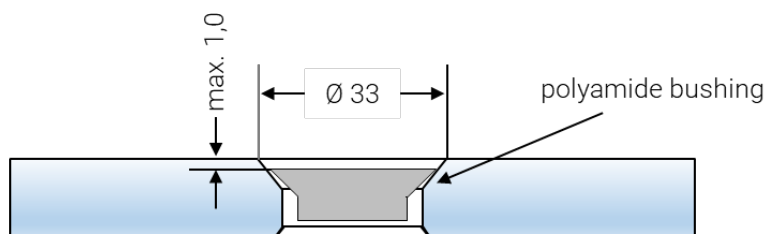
schematic representation of possible mounting positions of e.g. MULTI-POINT fittings, 90° countersunk (Dimensions in mm)
